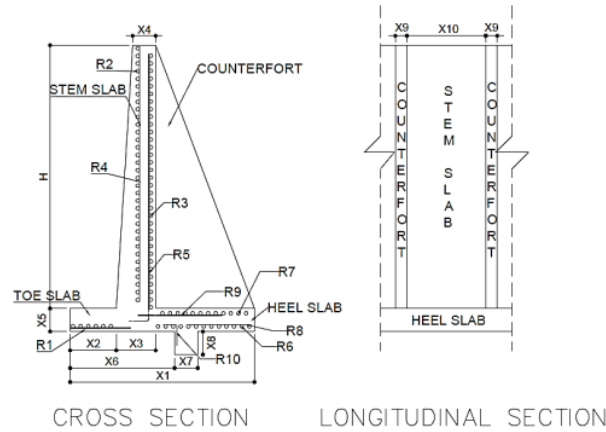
Modeling of Counterfort Retaining Wall with Shear Key
